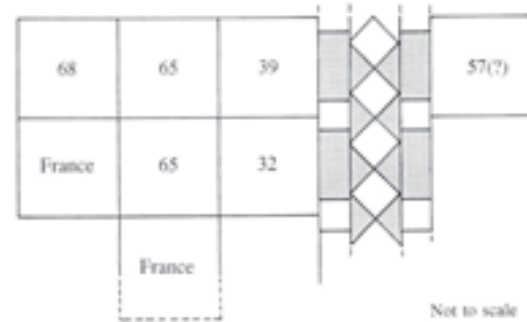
Reconstructed plan of a patch of medieval tile paving, formerly in the Lady Chapel. Redrawn from a sketch by D.J. Powell, 1810 (British Library). Scale c. 1:10
